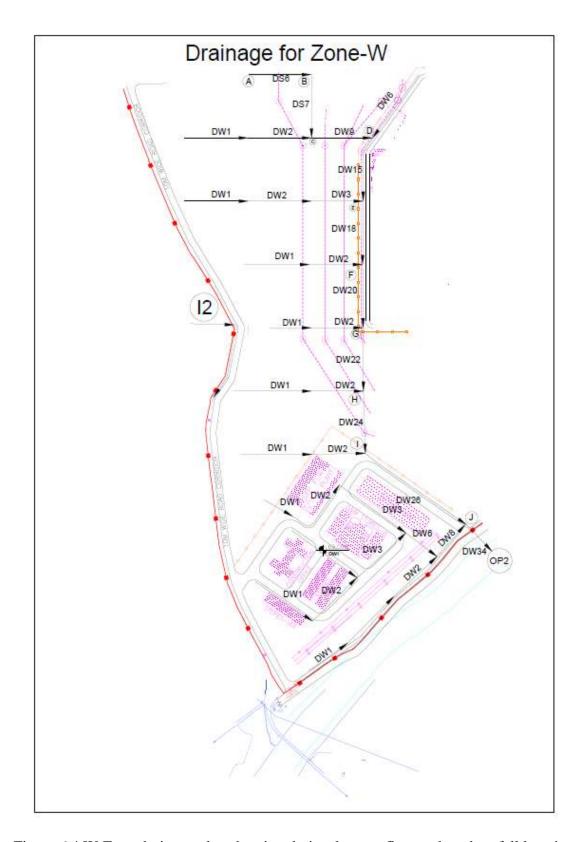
W Zone drainage plan showing drains, longest flow path and outfall location
